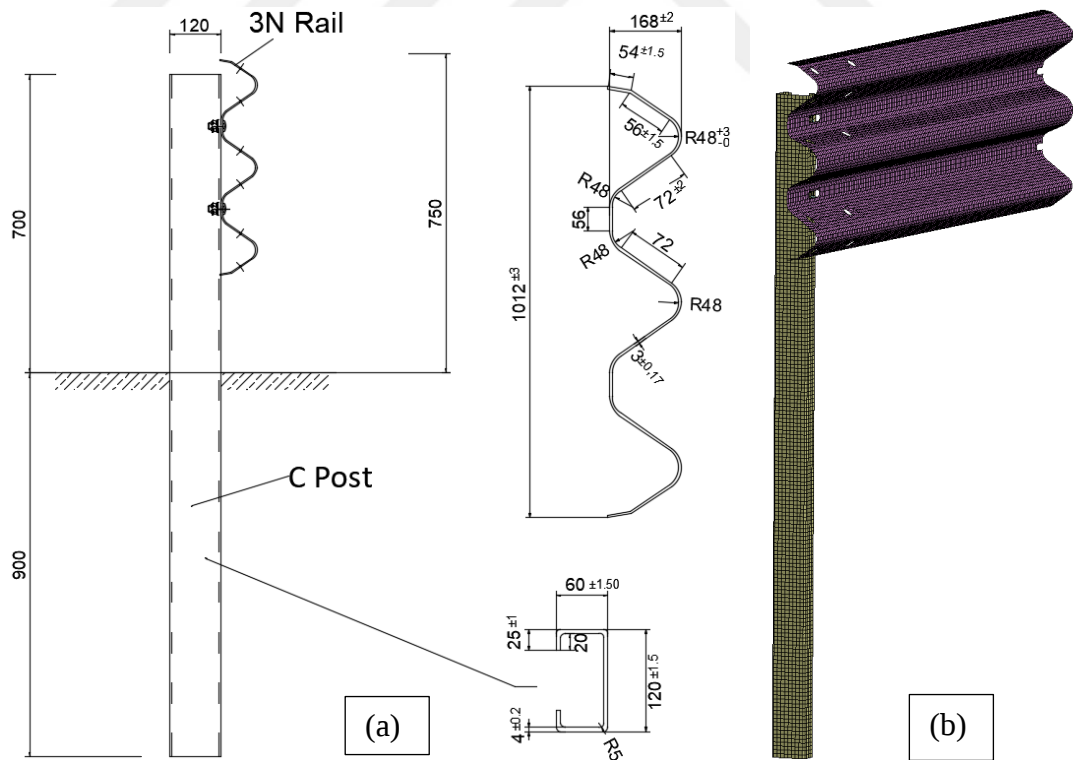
(a) H2W4 guardrail system details and (b) FE model of the design [49].
